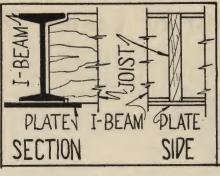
Wood Joist Resting on Steel Plate Attached to Under Side of Lower Flange of Steel Beam. This method is suitable for situations where there is considerable head room that can better be spared from the lower floor than from the upper.
